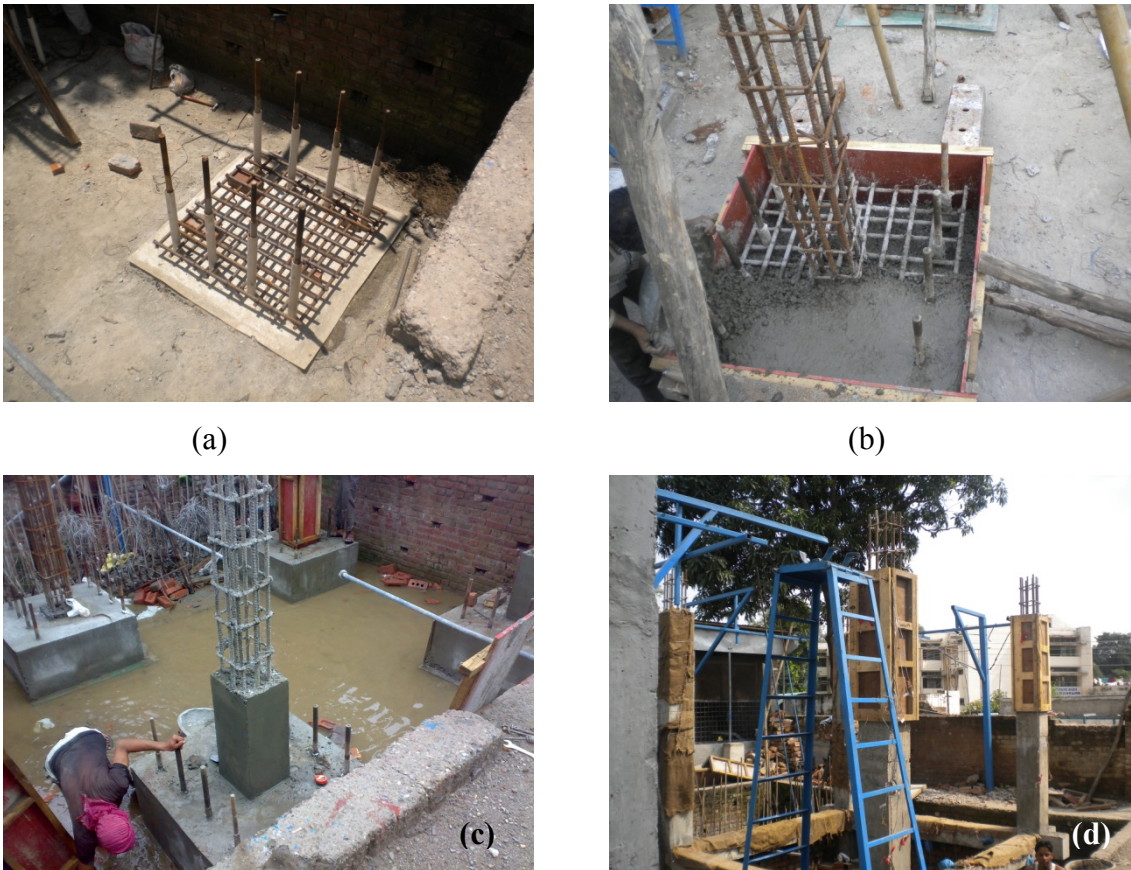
Construction stages of the frame (a) Protruding bolts from the strong floor and the reinforcement cage for footing. (b) Casting of footing. (c) View of the completed footings and the first lift of columns. (d) The final lift of the columns. (e) & (f) Casting of floor beams and slab. (Contd.)
